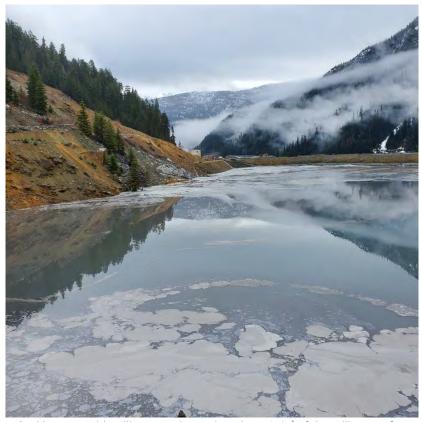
Lynx TDF, looking east with tailings pond covering about 2/3rd of the tailings surface. (March 22, 2022)
